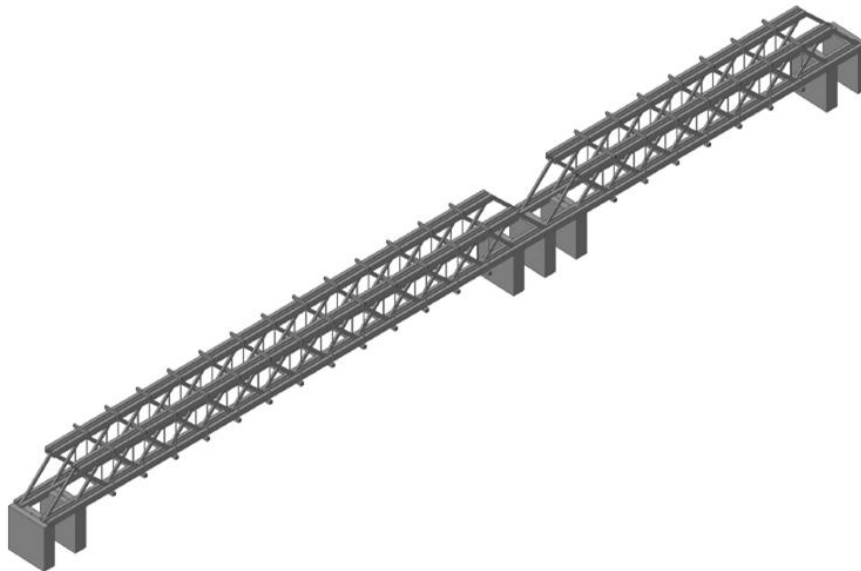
Pre-design Proposal 3 - 3D Structural Isometric View - SCIA Engineering
